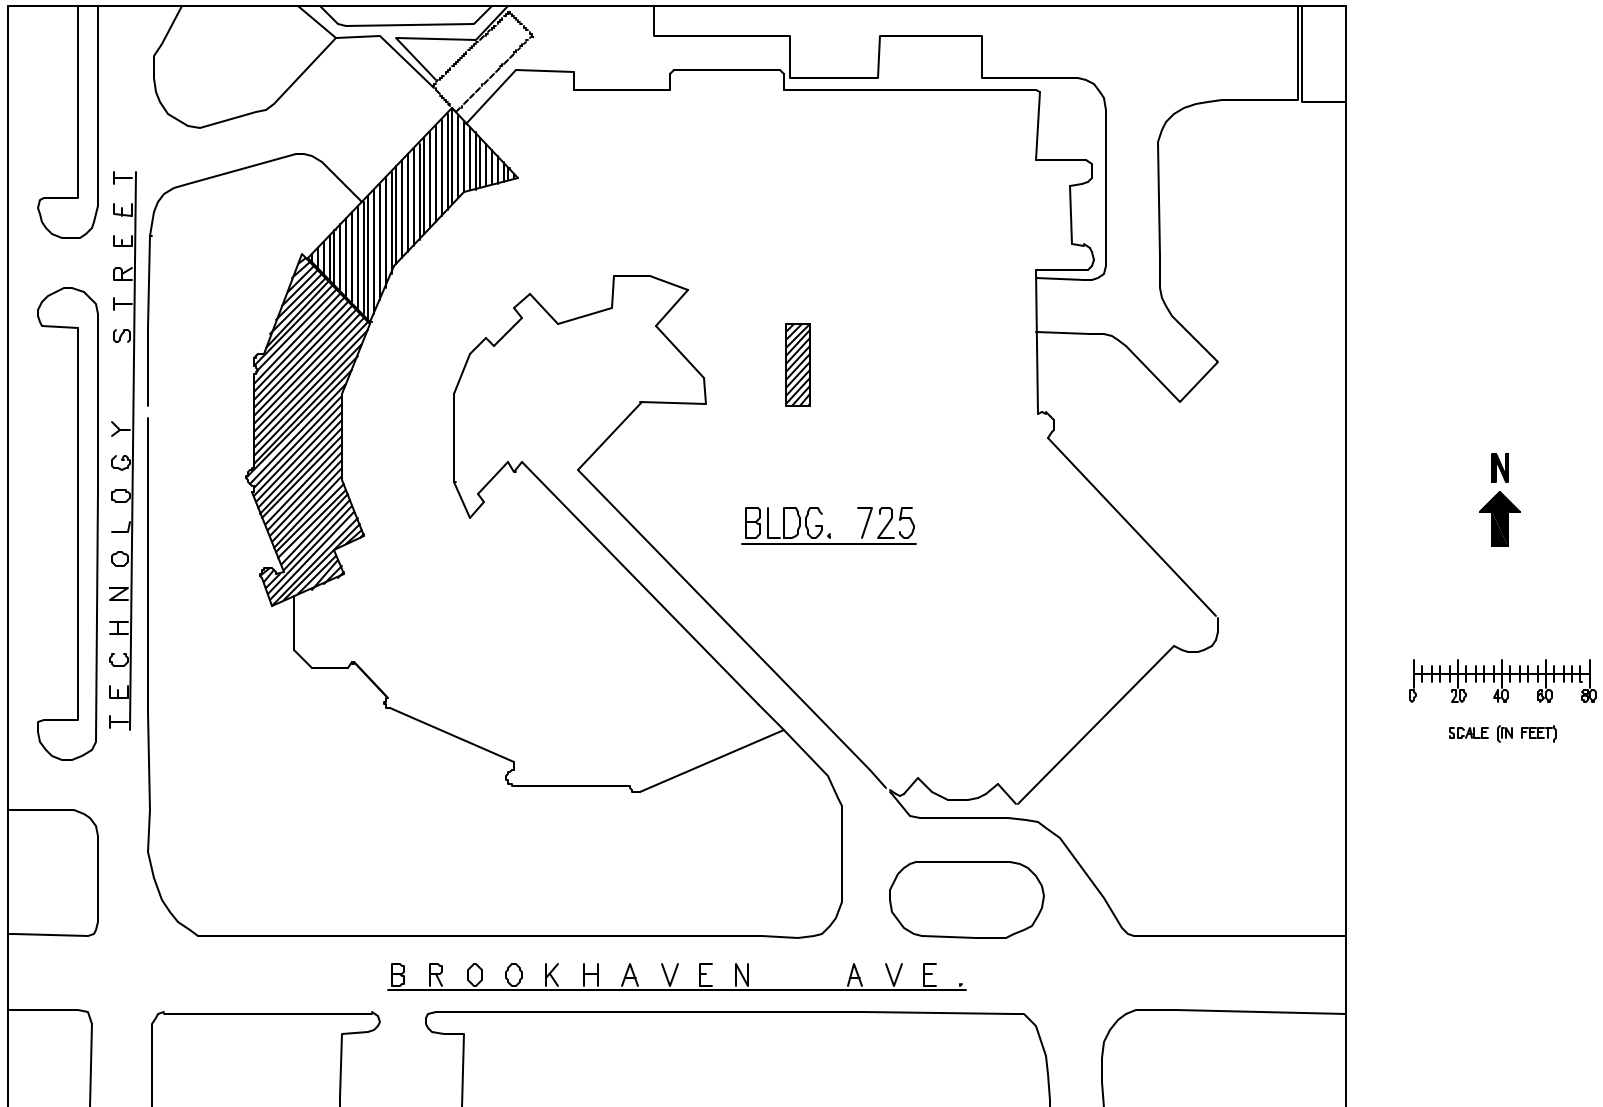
Proposed 9300 square foot additions (cross-hatch) to the NSLS, Building 725.
